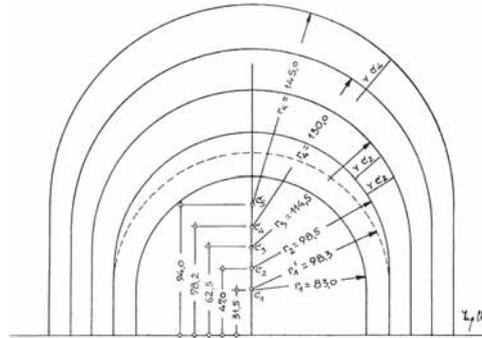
Studenica, architectural drawing from the south façade of the nave (source: Nenadović, Studenički problemi, fig. 9)
